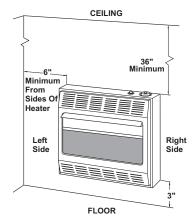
Mounting Clearances As Viewed From Front of Heater
